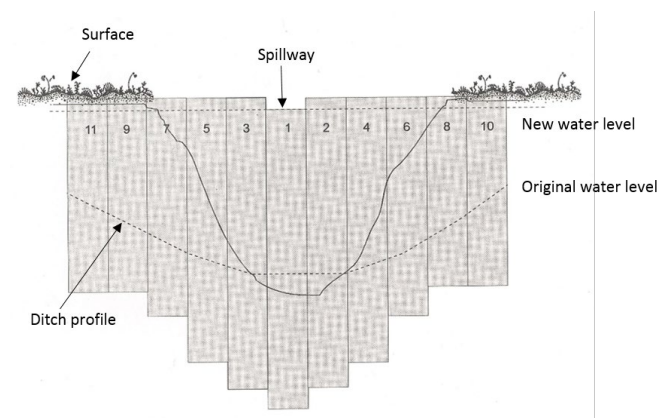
Plastic piling dams are best constructed in the following sequence, starting from the centre and working outwards towards the side of the ditch.
